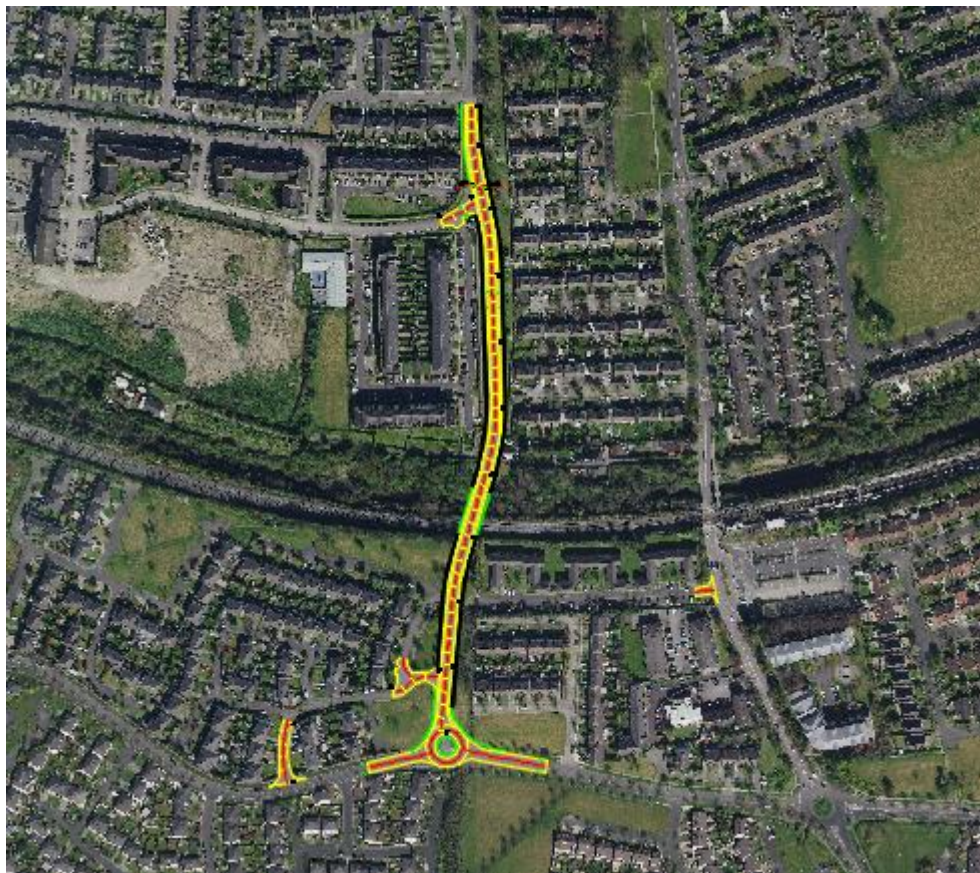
Coolmine Option 5 - New Underbridge Connecting St. Mochta's Grove / Station Court to Riverwood Court with Diversion of Canal over Proposed Road (Copyright Ordnance Survey Ireland – 0039720)
